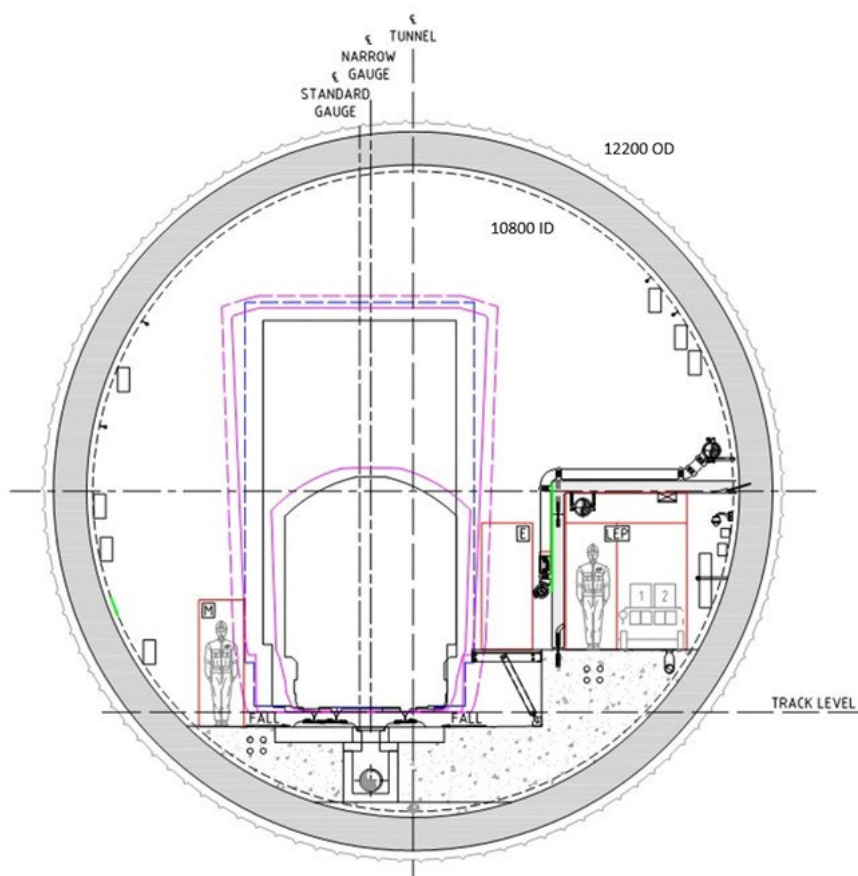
INTERNAL CROSS SECTION OF THE TOOWOOMBA RANGE TUNNEL
